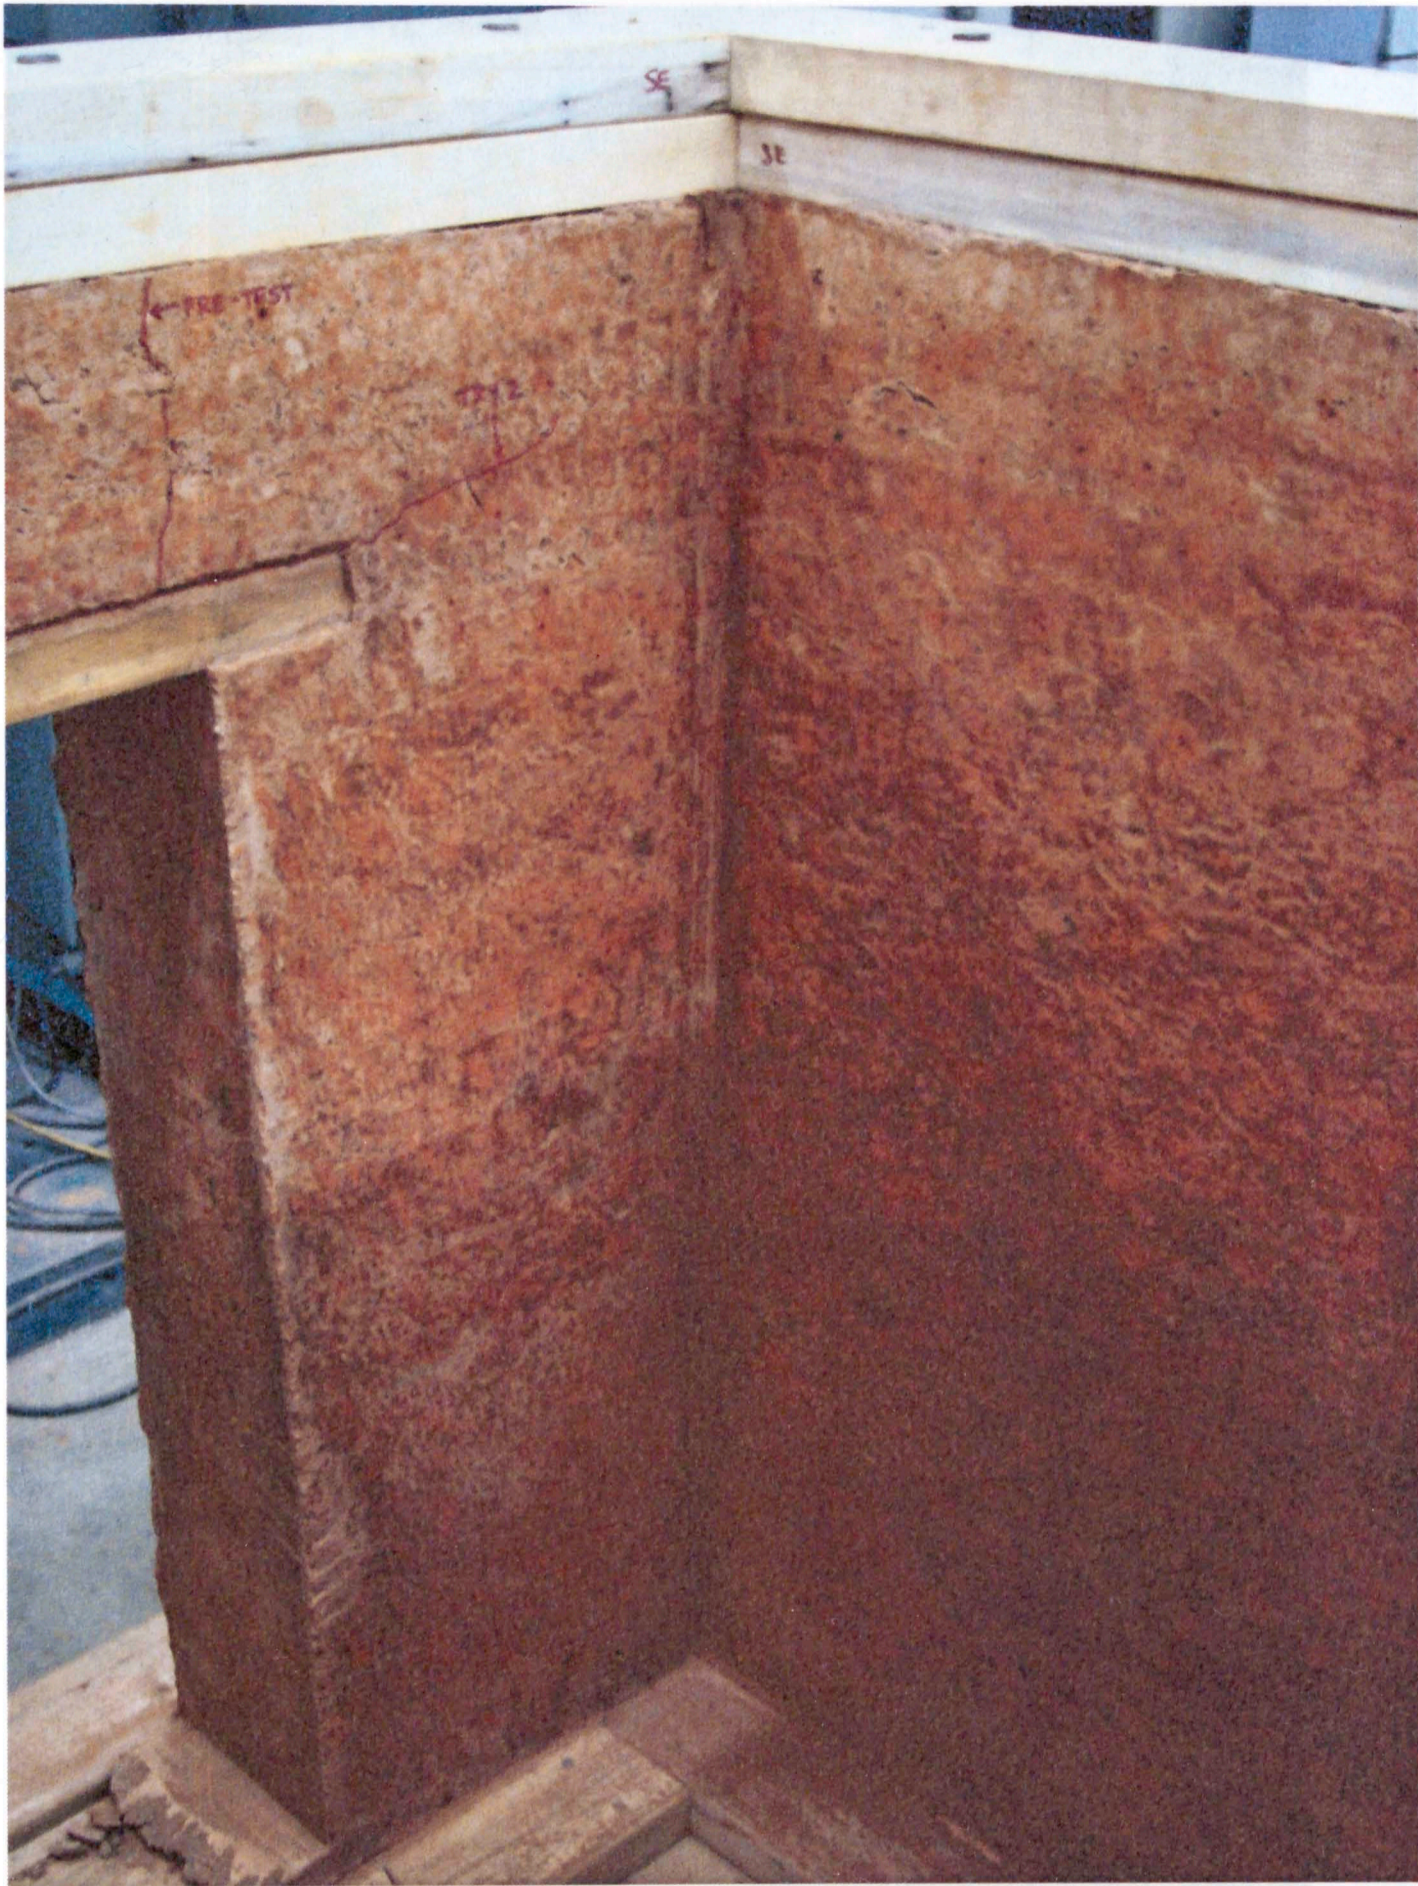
Test 3 view of interior southeast corner after test, note cracks outlined in red
